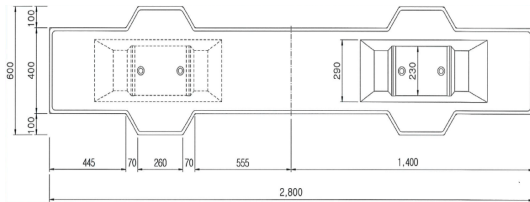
Floor plan of wide sleeper for quick-hardened concrete track
